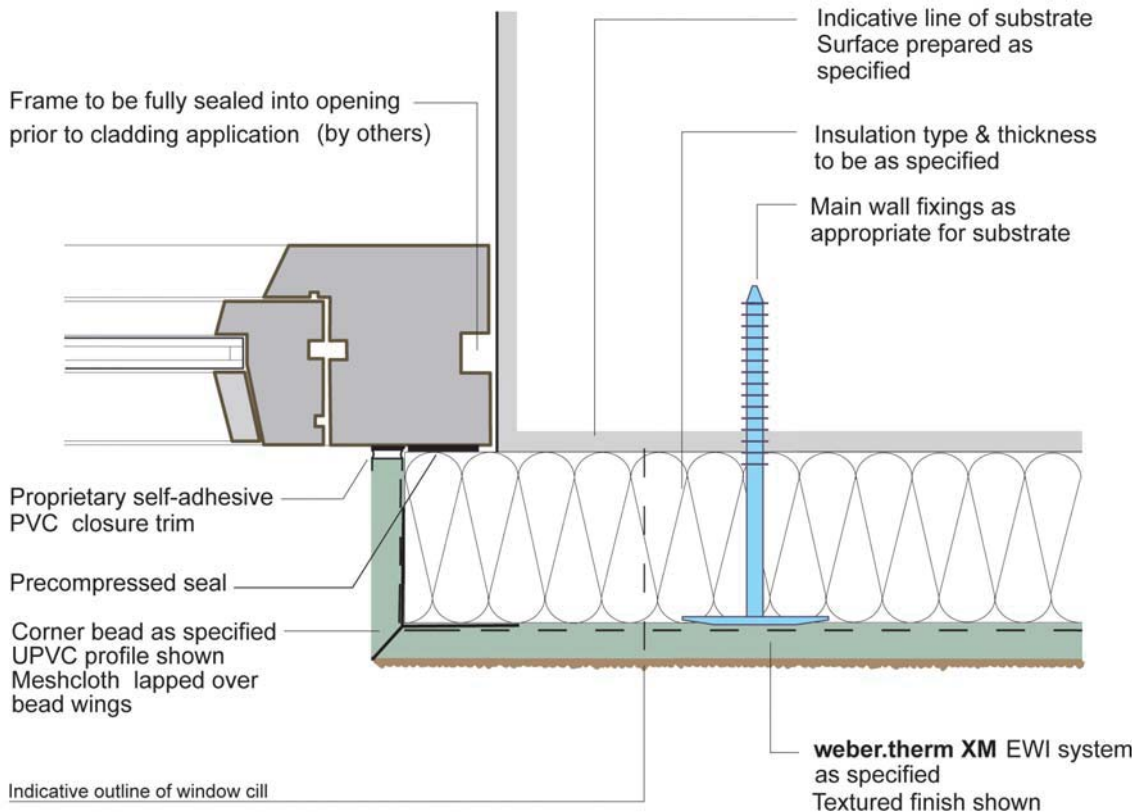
Detail Plan – Window Reveal (Frame Seal)
